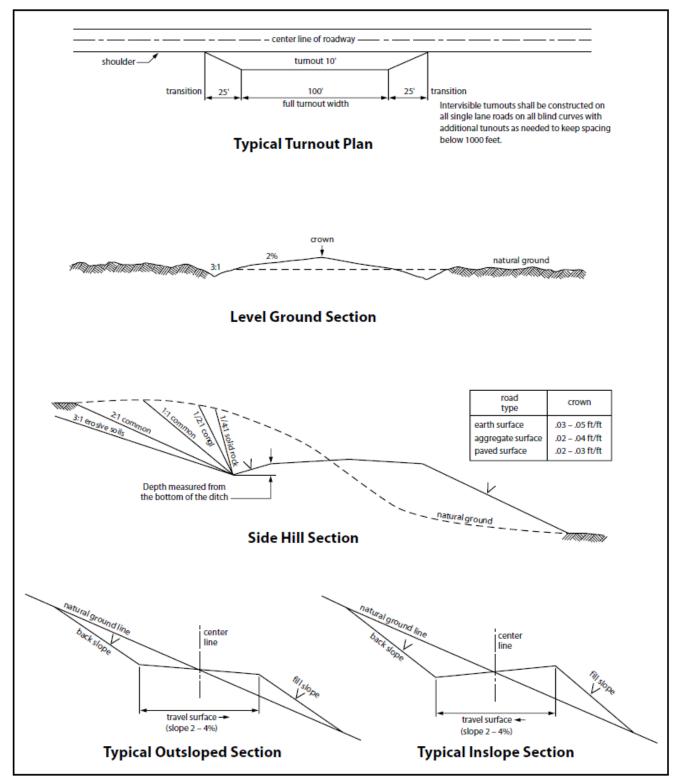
Cross-sections and plans for typical road sections representative of BLM resource or FS local and higher-class roads.
